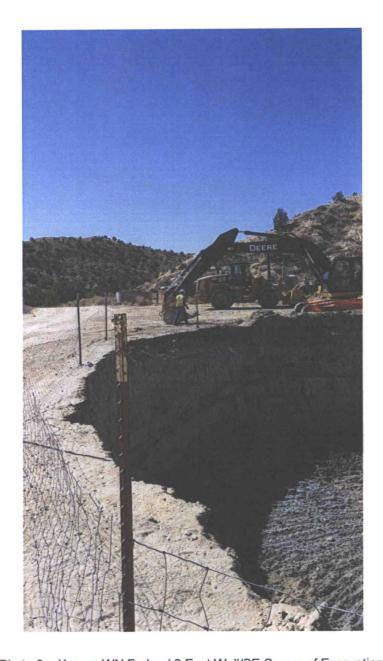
Krause WN Federal 2 East Wall/SE Corner of Excavation.
